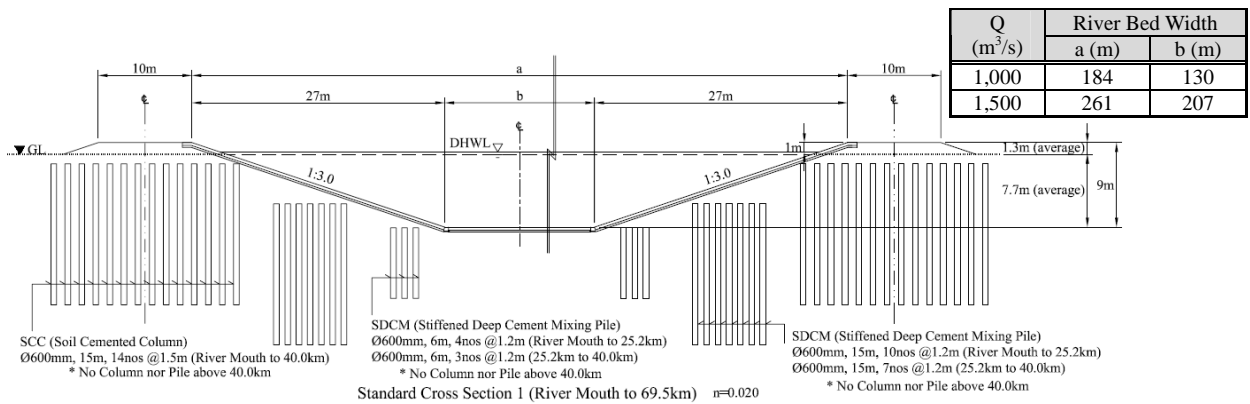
Alternative Cross Section of West Diversion Channel with Slope and Riverbed Protection (0km to 69.5km)
